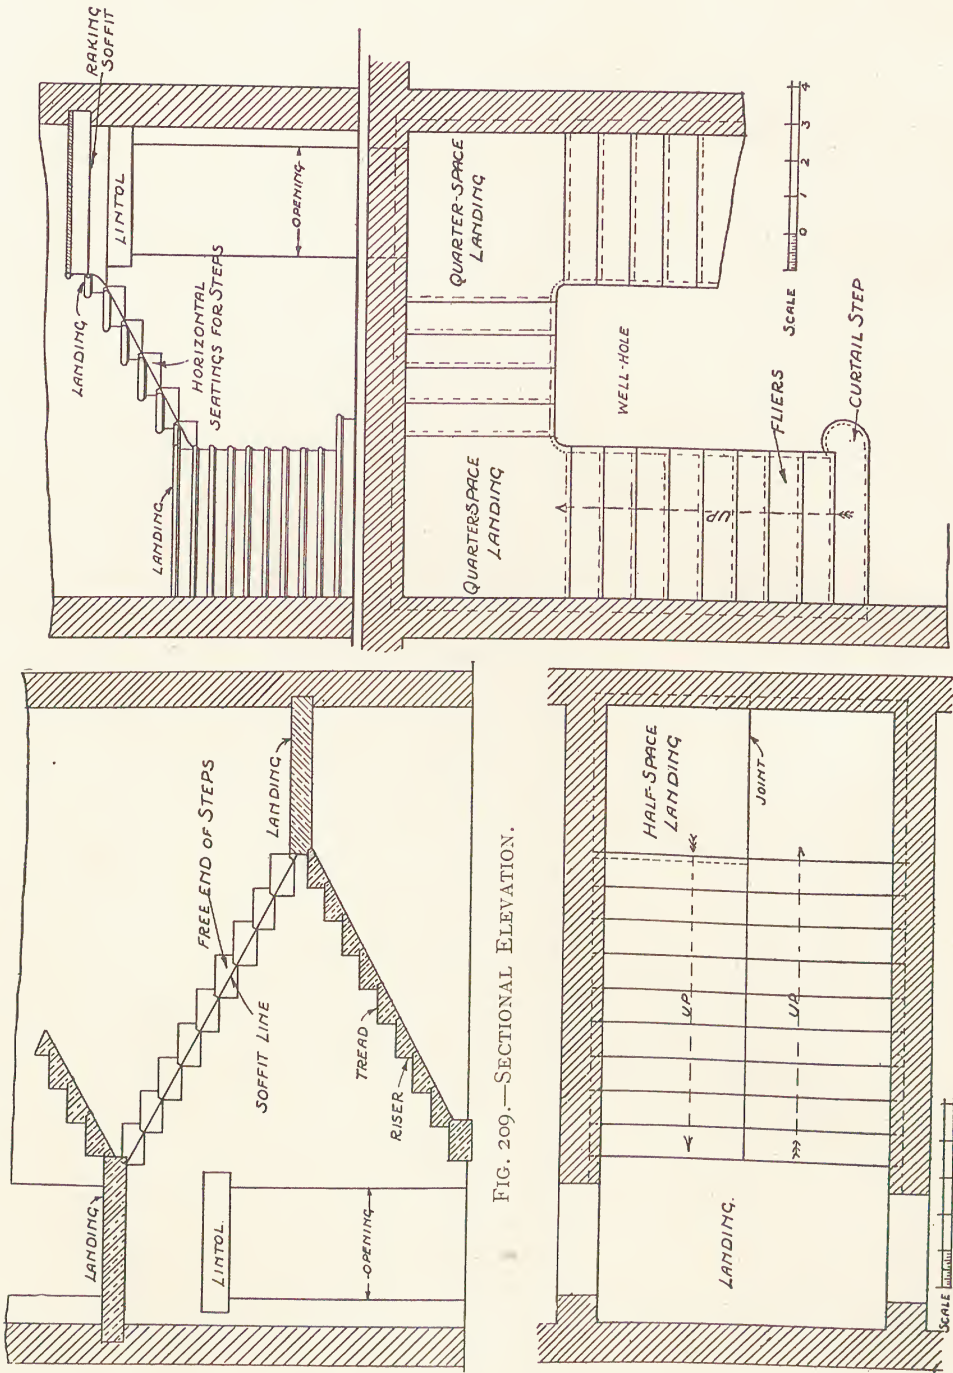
PLAN OF DOG-LEGGED STAIR.
